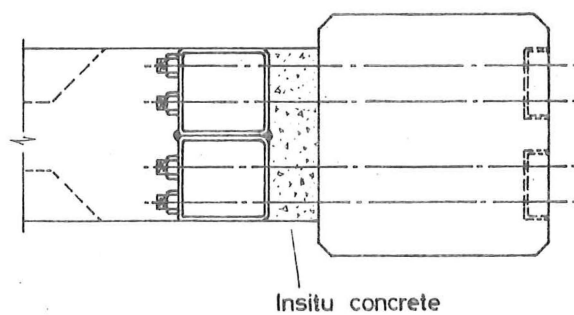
A PRESTRESSED CONCRETE JOINT WITH A RISING SPRING-RATE.
